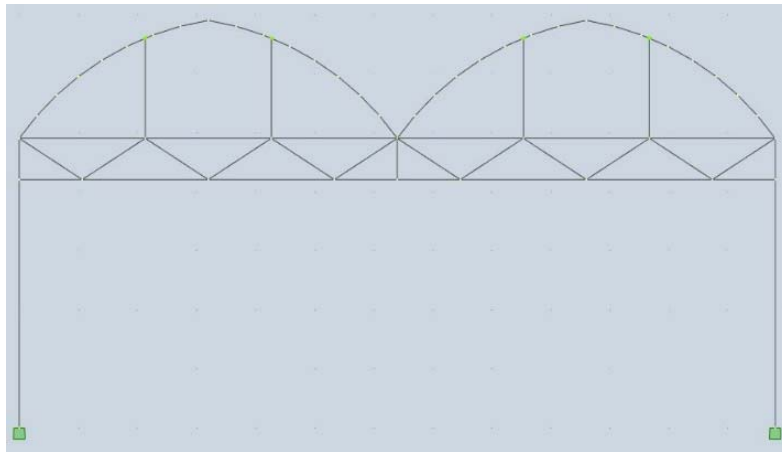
Strut and tie model of the analysed foil tunnel frame [source: authors' archive]
